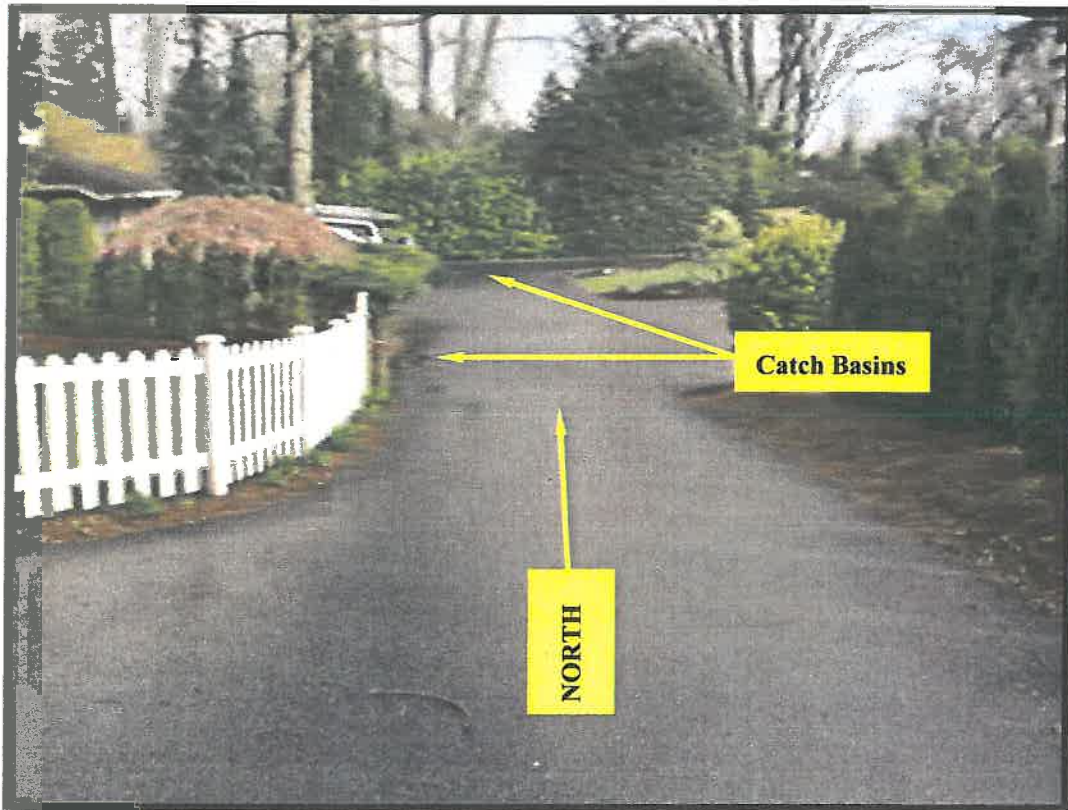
Driveway leading from 3211 – 84th Avenue SE north to Coval south property line.
